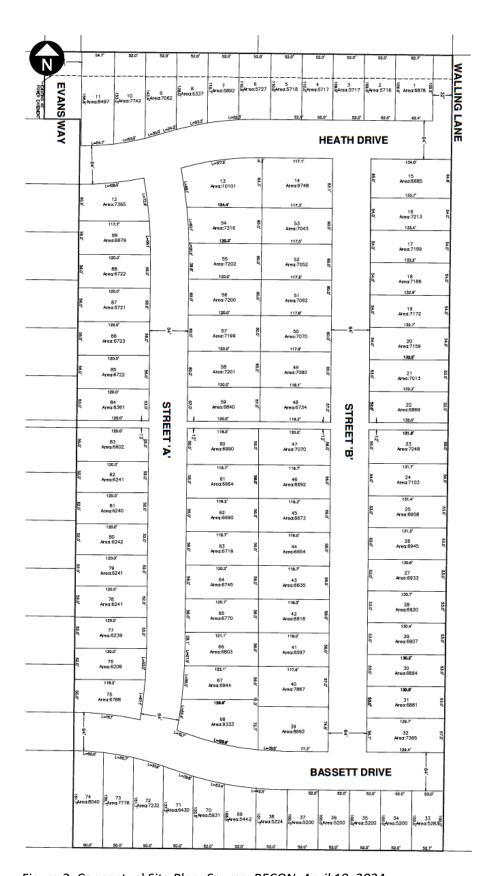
Conceptual Site Plan. Source: BECON, April 10, 2024
